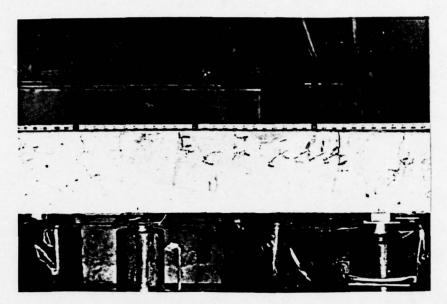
A view of Beam T-3-P at a load of 9.75 kpj.
